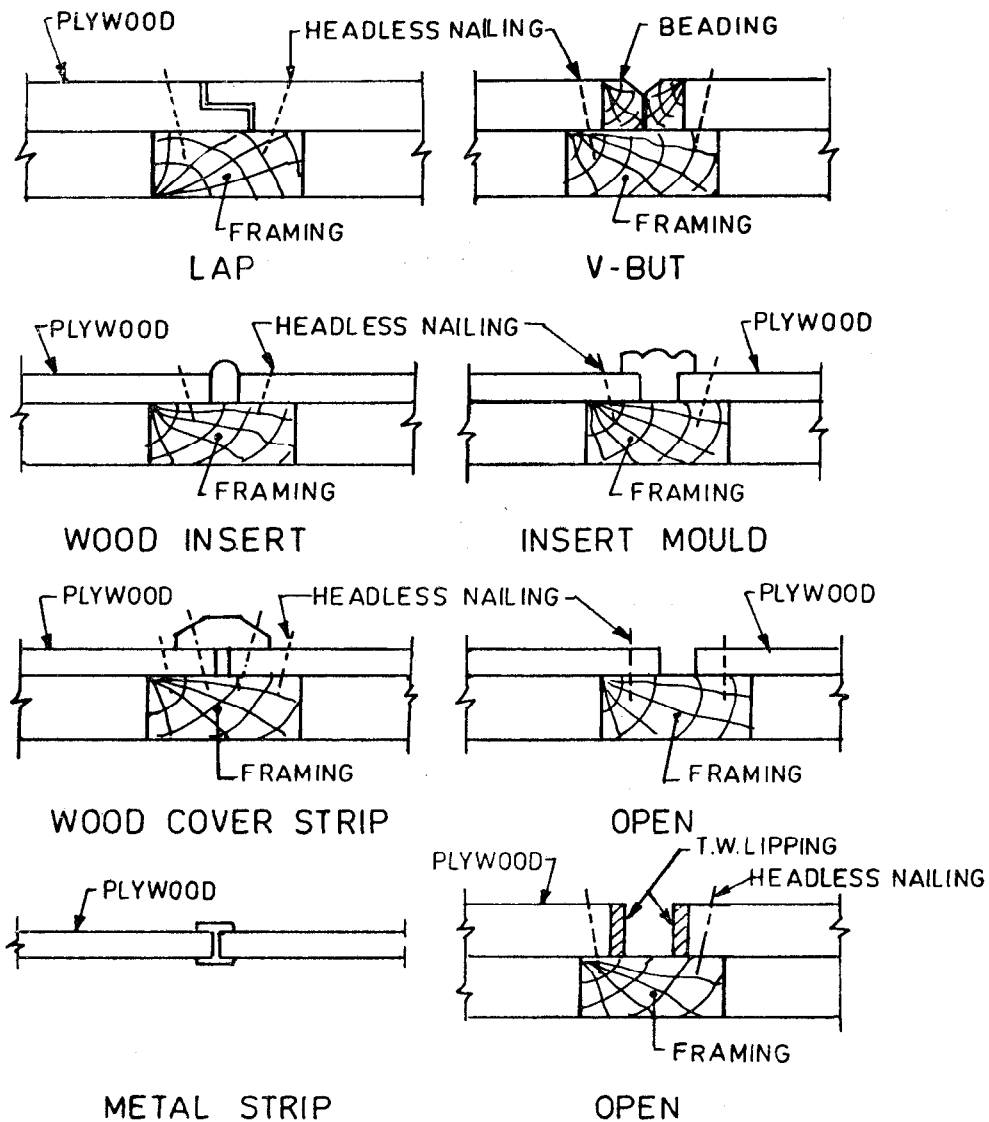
FIXING PLYWOOD WALL SHEATHING
